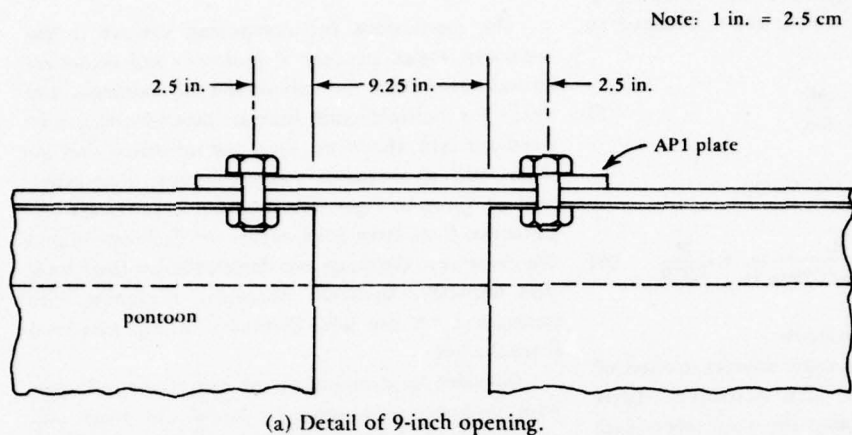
Model of connection angle at 9-inch (23-cm) opening between pontoons.
